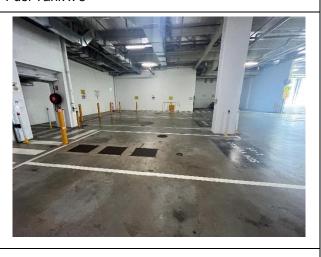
Lower Ground, Loading Dock, Parking Bay L-05, Unknown Pit x 3
